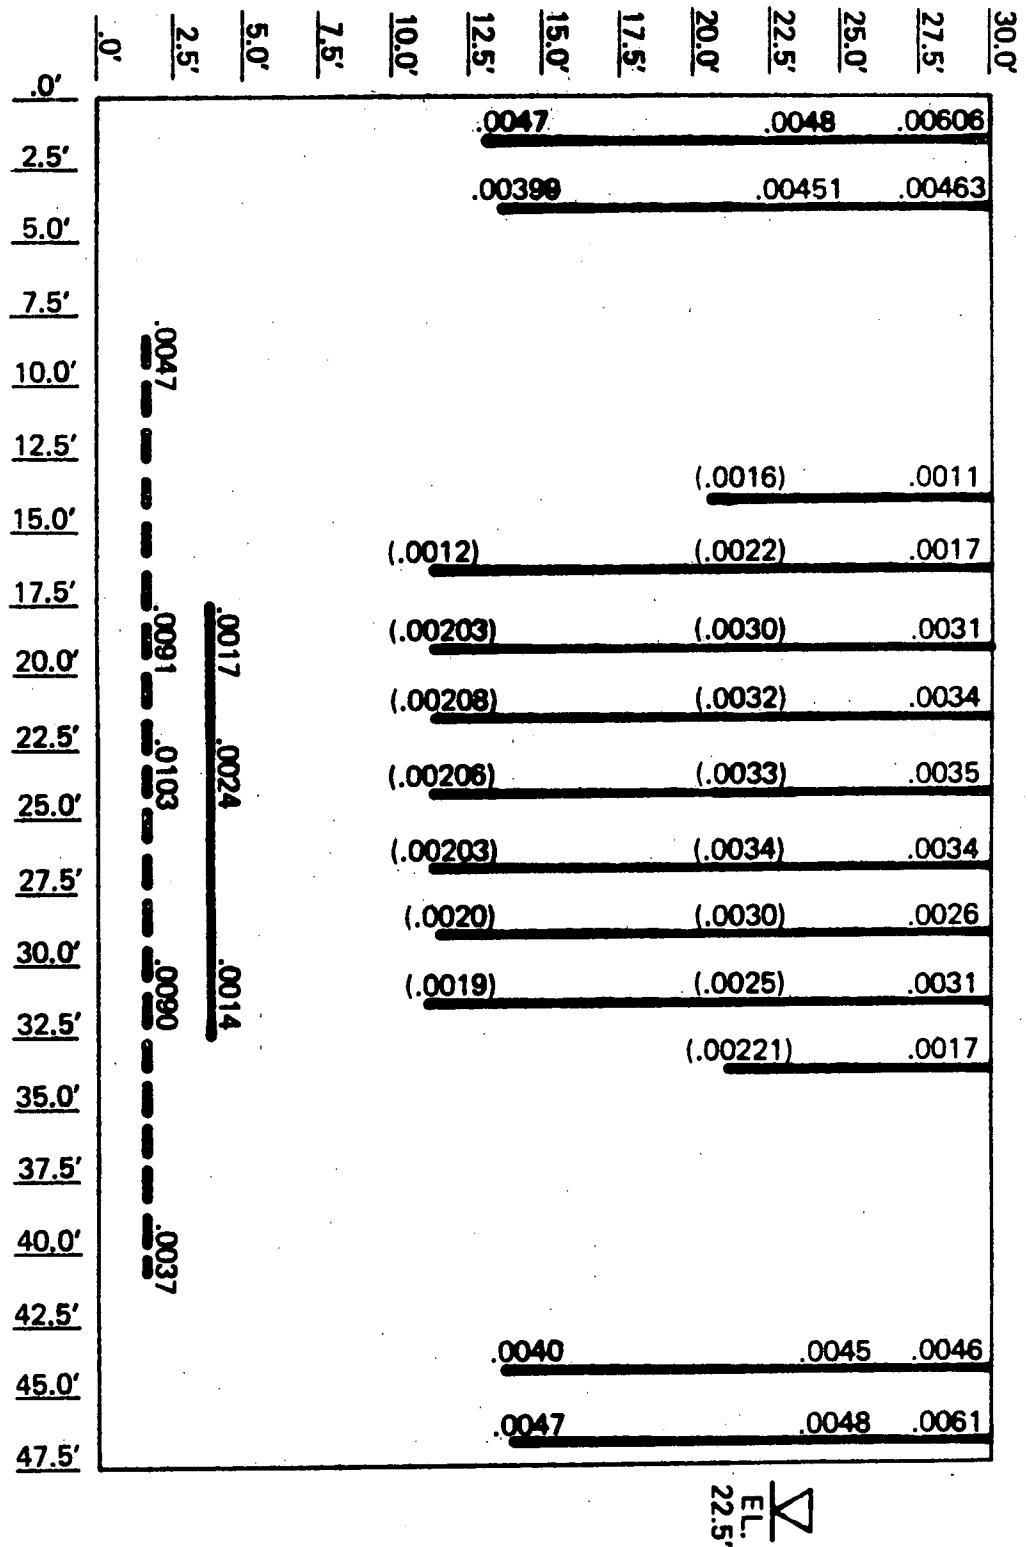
CONDENSATE STORAGE TANK AREA WALL-4
